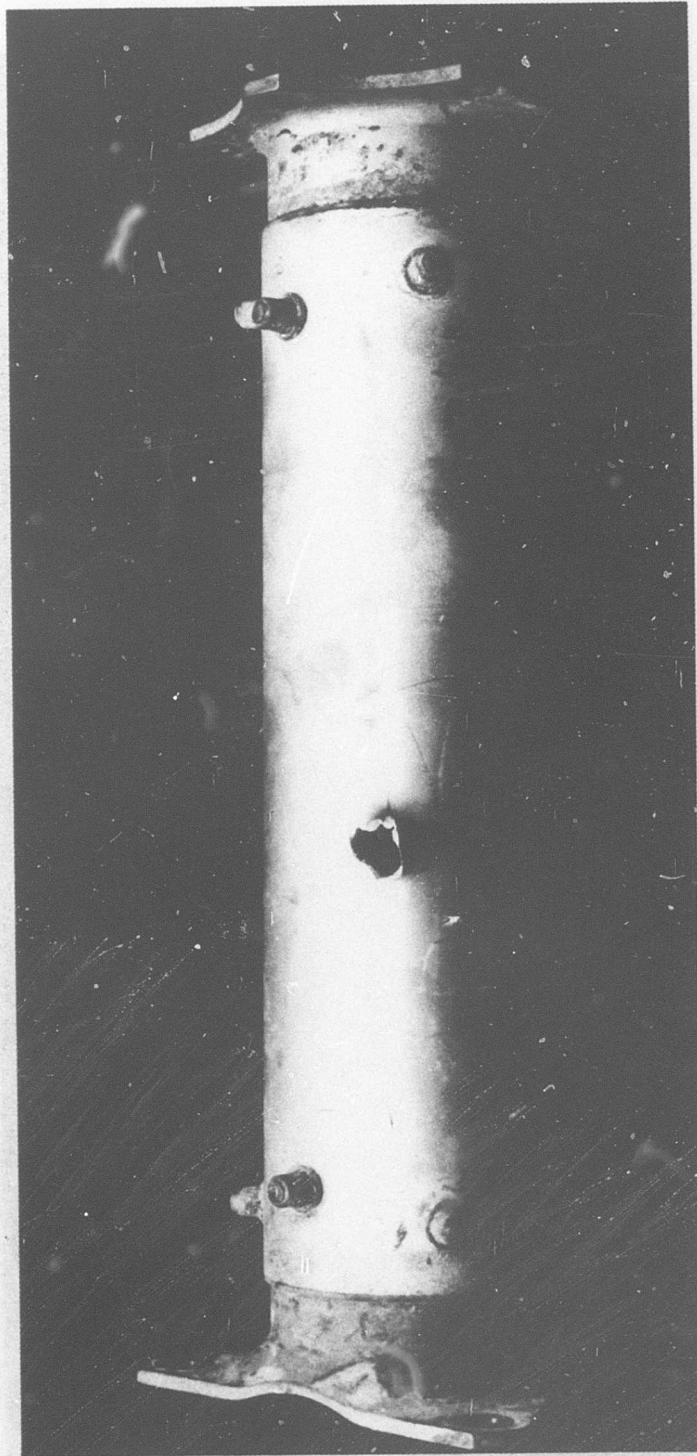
Aluminum Specimen 9, Exit Hole Damage.
